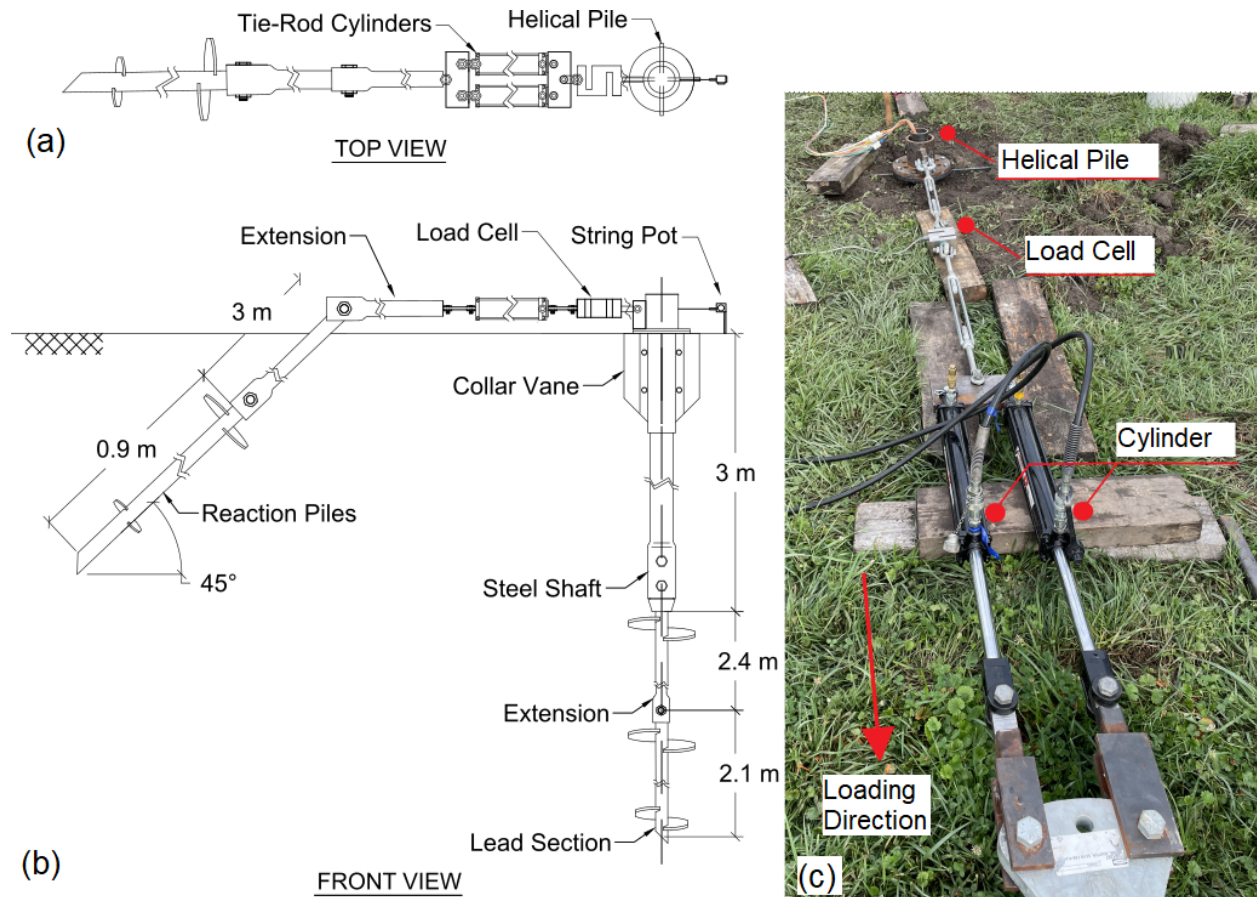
Lateral load test setup in cohesive soil: (a) top view; (b) front view; and (c) photo.
